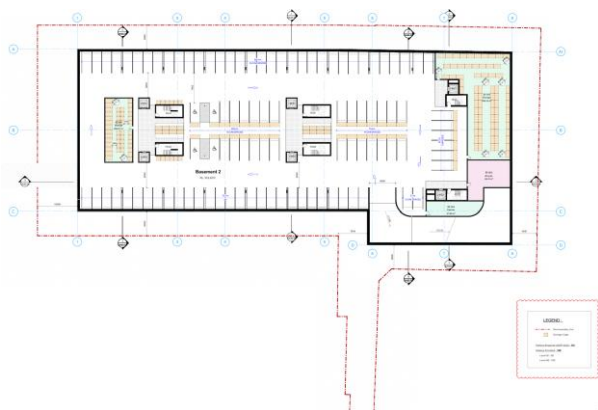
Previously proposed Basement 2 (Source: PMDL Architects)
